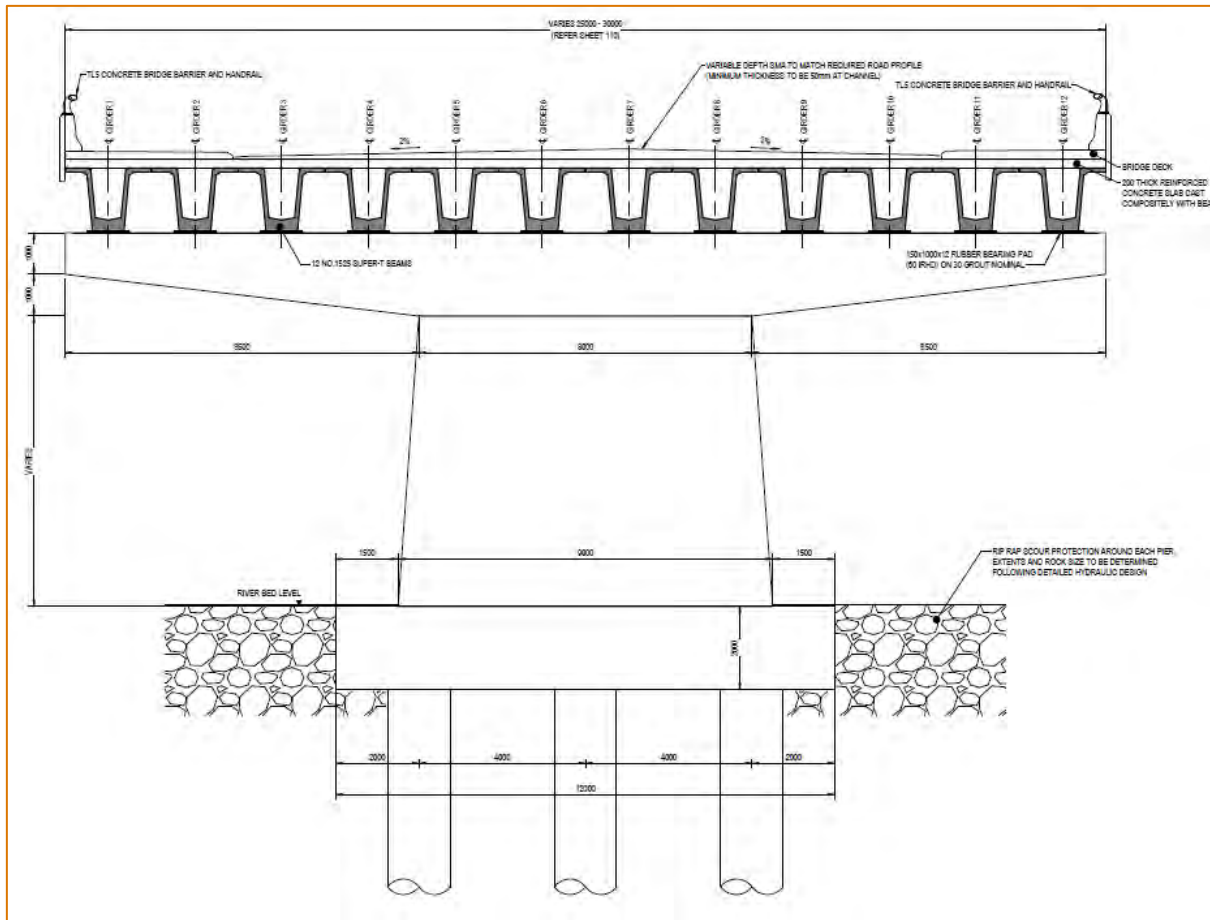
Proposed Hutt River bridge typical cross-section at pier
